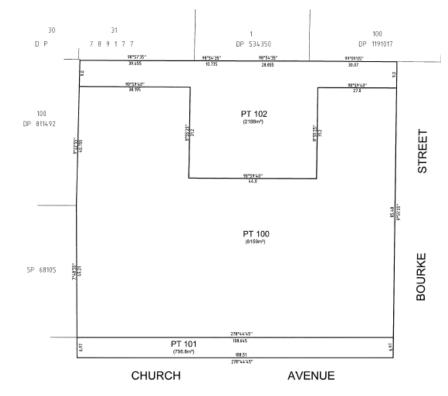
Proposed Subdivision of the site separating roads and park to be dedicated to Council
